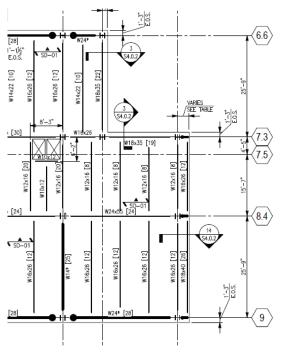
Notched Corner Drawing Courtesy of JCJ Architecture
